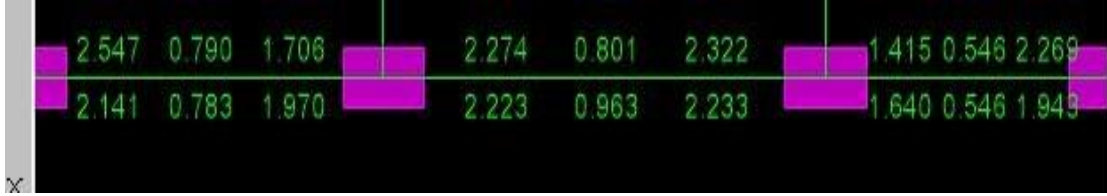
Reinforcement Area of 2<sup>nd</sup> FLOOR (Y-Axis)
